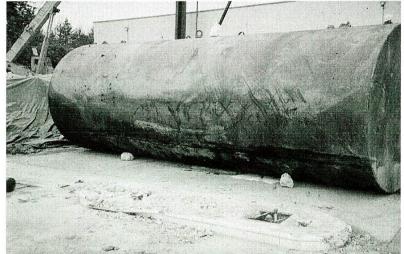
EXCAVATED UNDERGROUND STORAGE TANKS
